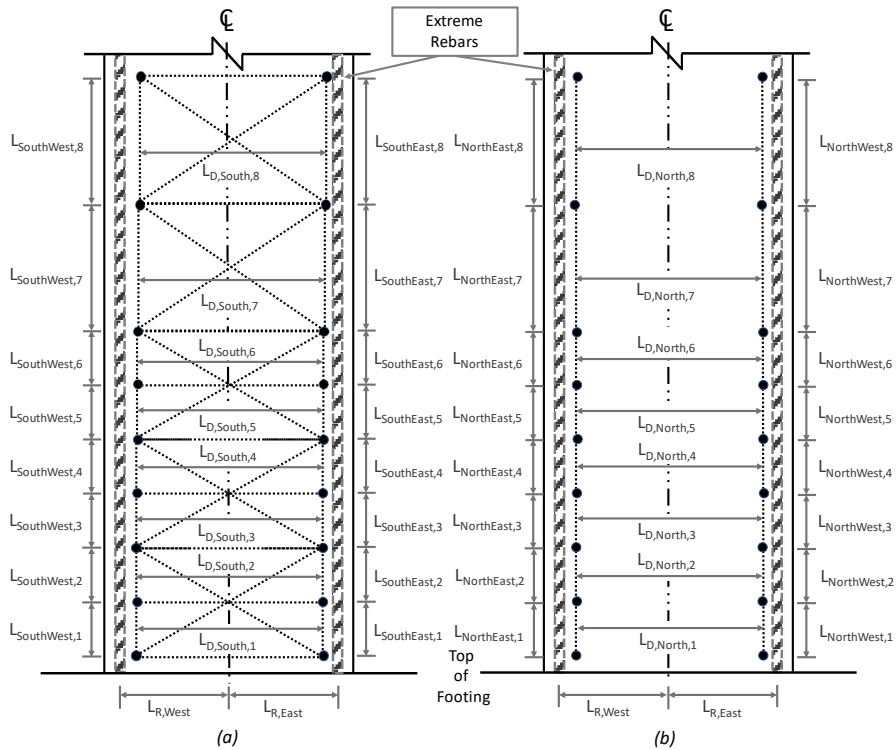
Schematics of column deformation panels on: (a) South face; (b) North face.
